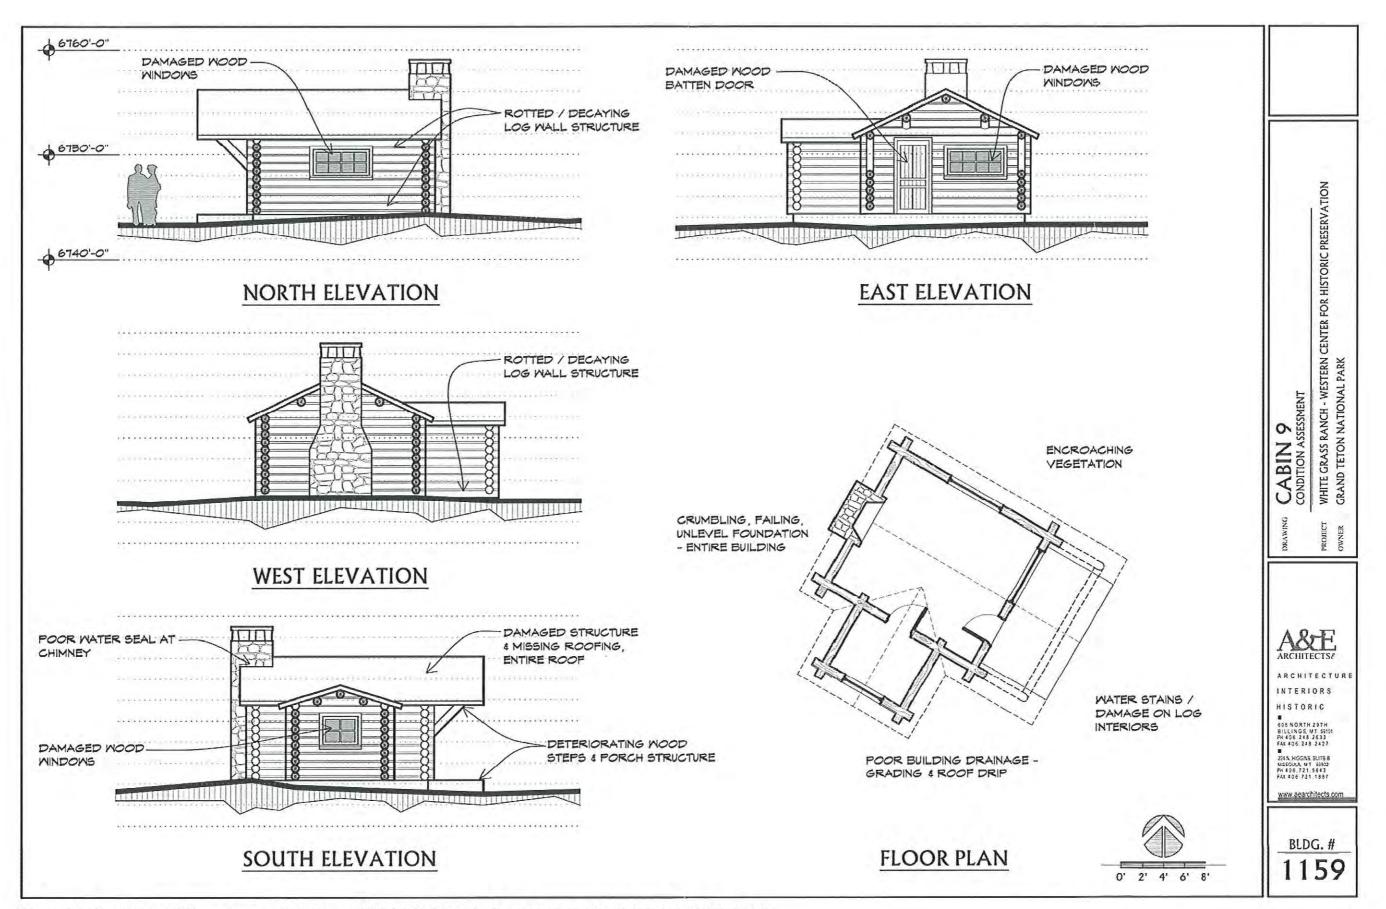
Existing conditions plan and elevations of HS-1159, Cabin 9, showing areas of deterioration (A&E: 2006).
